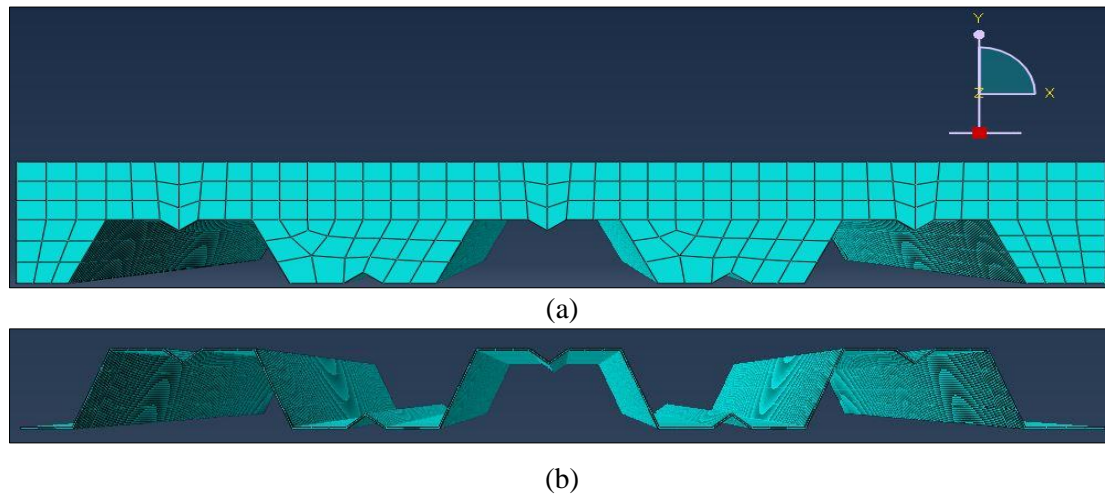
Model of concrete and deck profiled sheet with intermediate stiffener.
